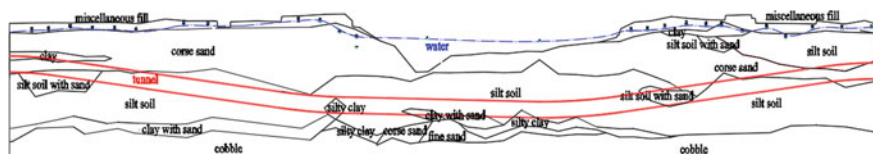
Strata profile of shield tunneling construction in Fuzhou
